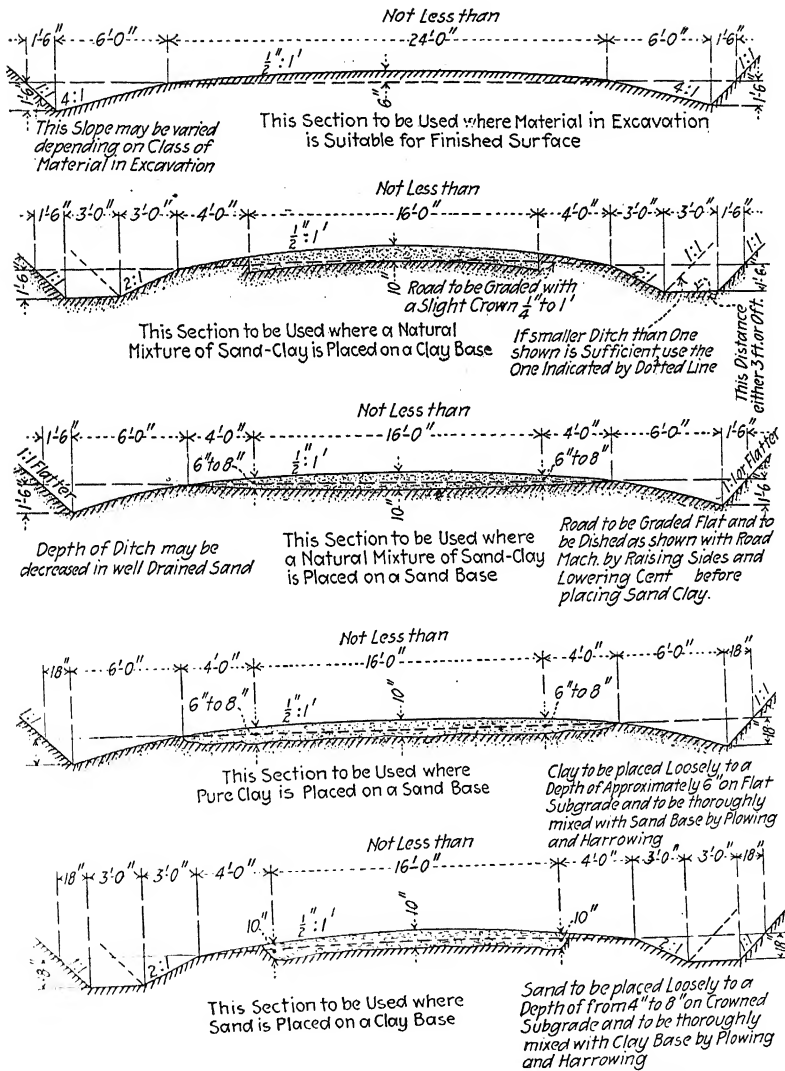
Typical sections (Alabama). Sand Clay Roads.
